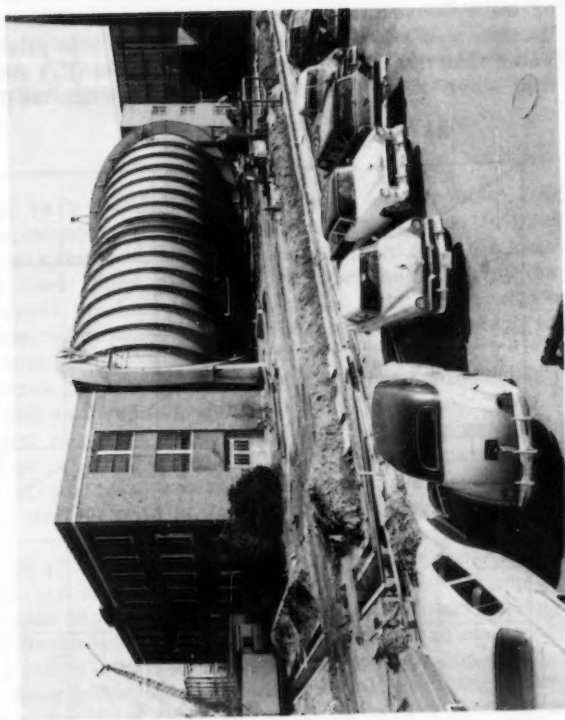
SOUTH END OF 19-FOOT PRESSURE TUNNEL
